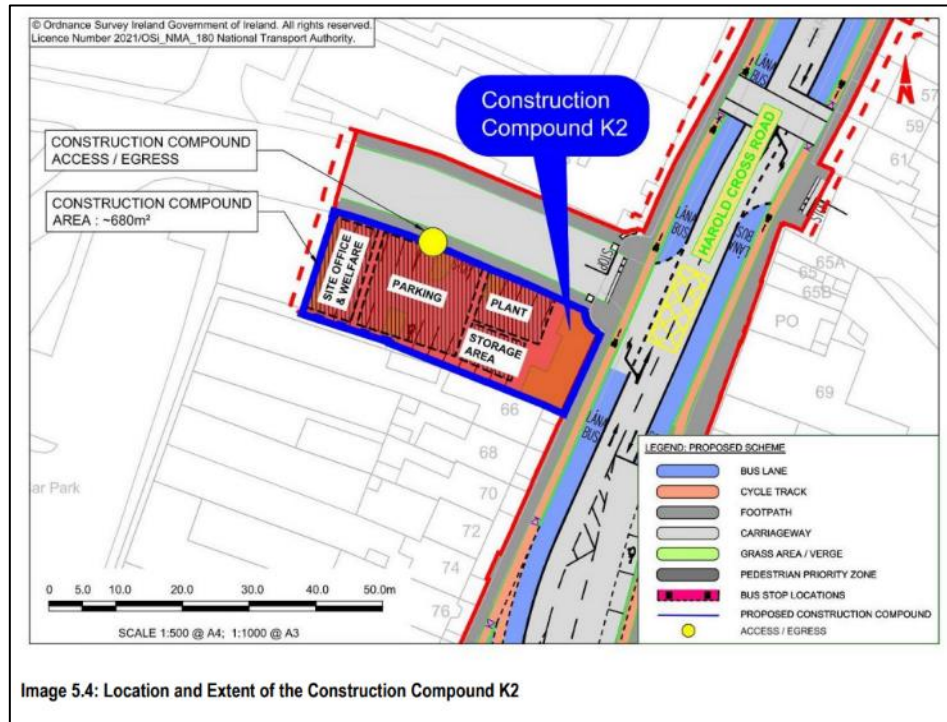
Construction Compound K2 at Our Lady’s Hospice
